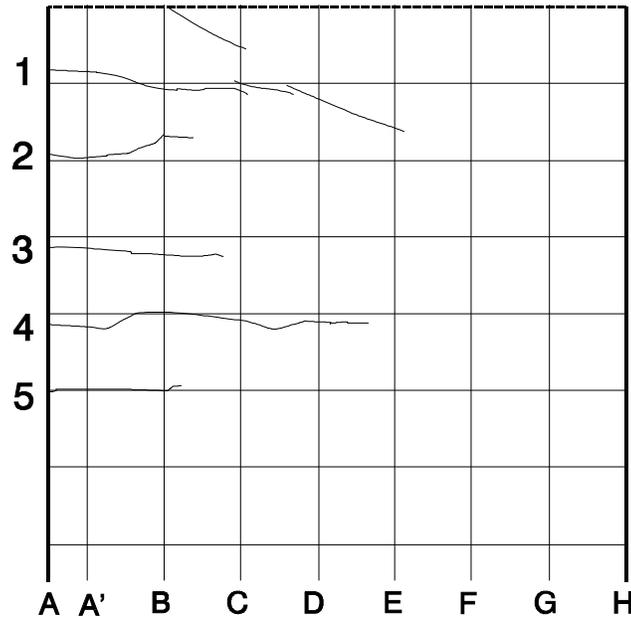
POJ-PS-100 cracking patterns on north face of pier at dead load
